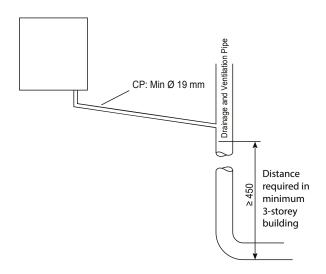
Connection of Condensing Water Drainage Pipe to Internal Drainage and Ventilation Pipe
